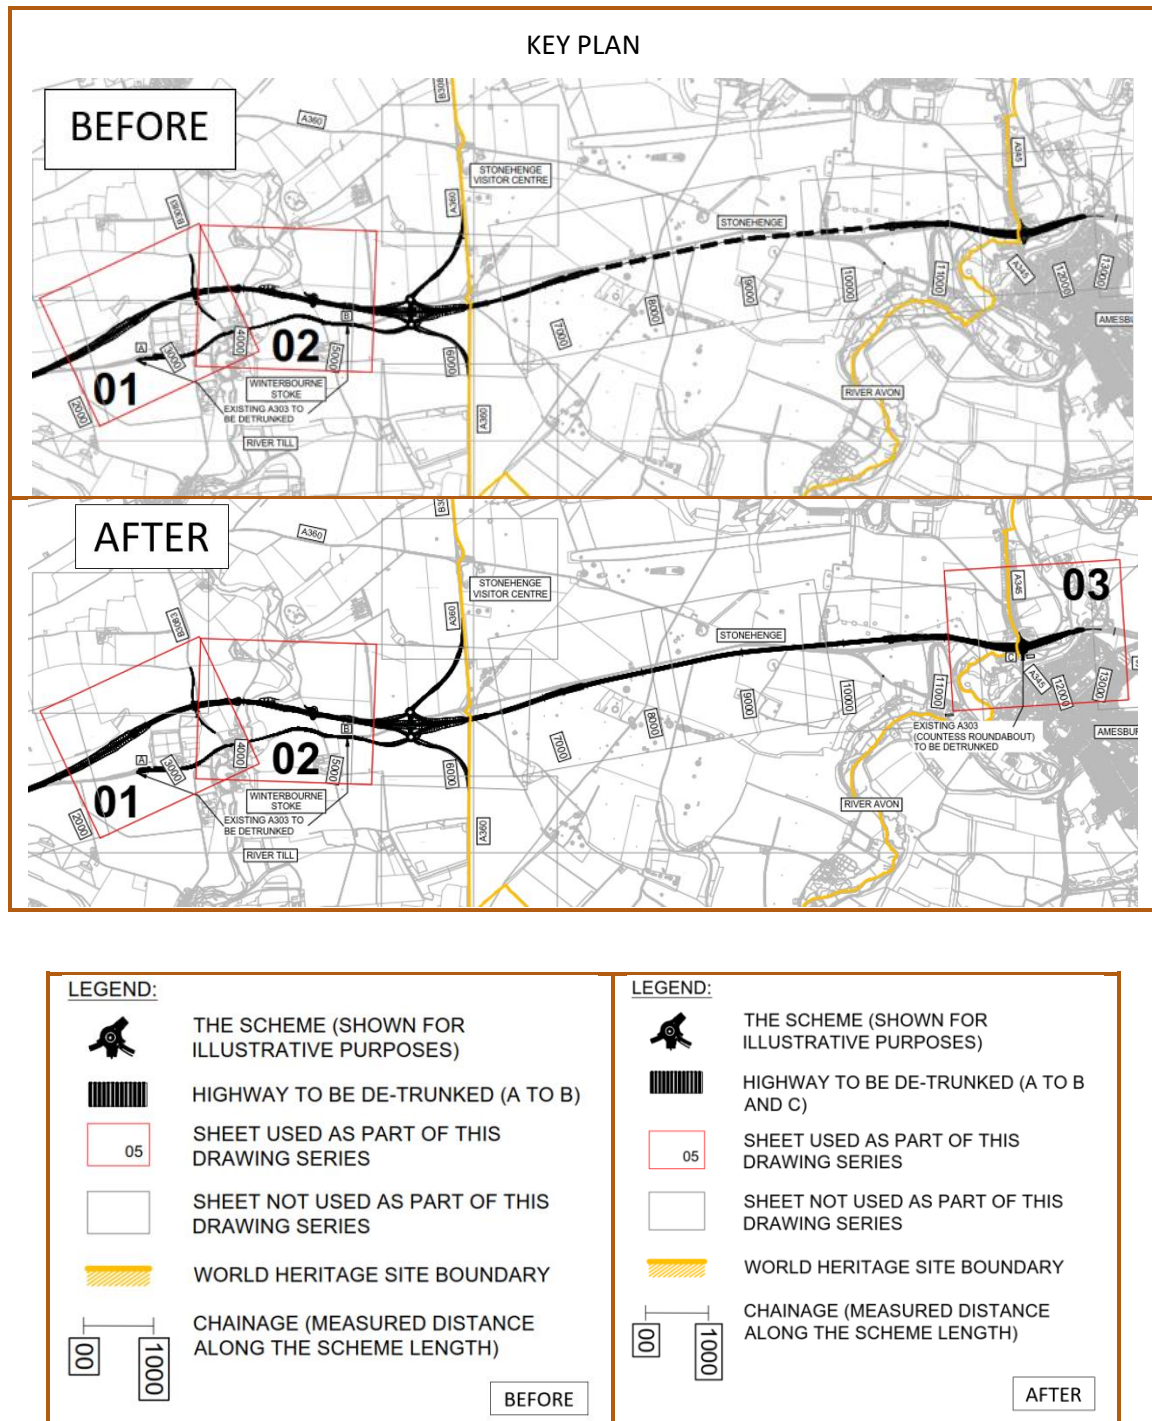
Extract from De-Trunking Plans [APP-015]
